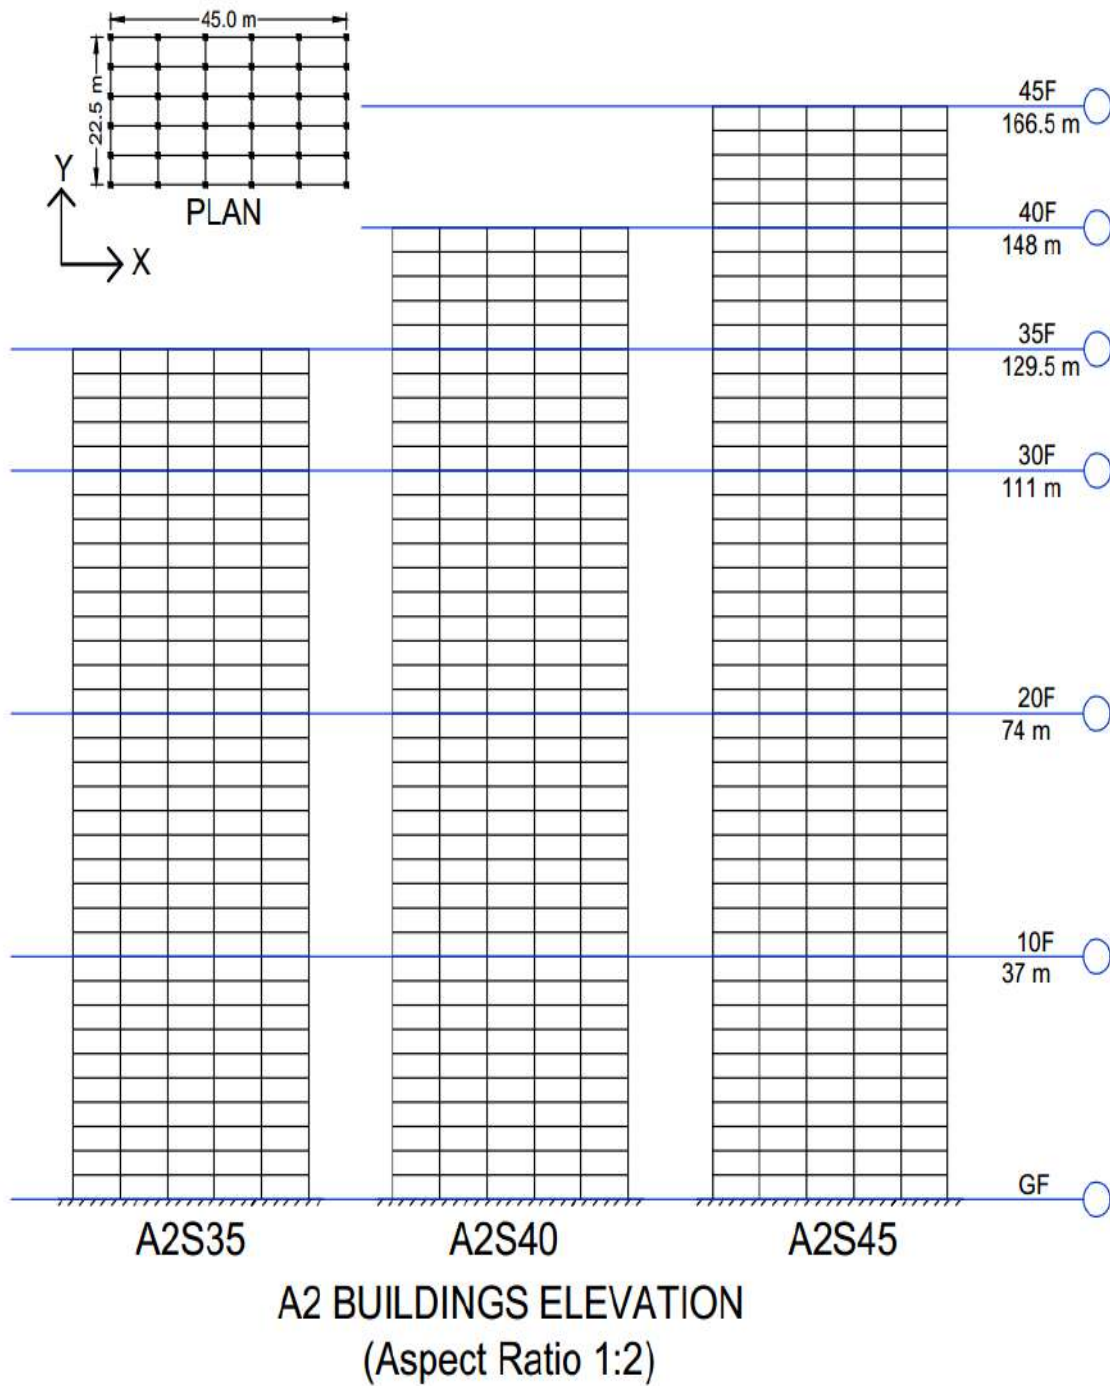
Plan and Elevation A2 Type Buildings (Aspect Ratio = 1:2)
